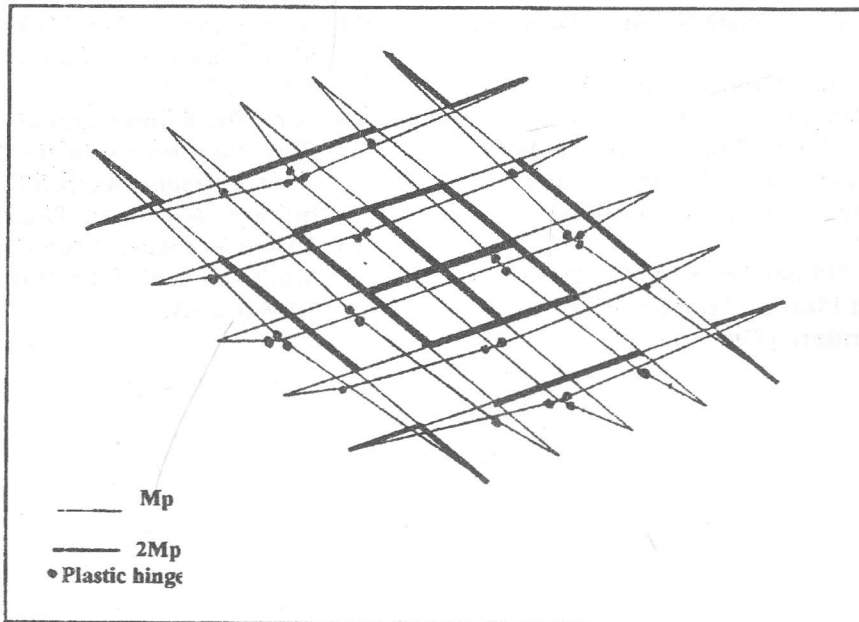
Mode of collapse for the floor (47% of floor beams are reinforced)
